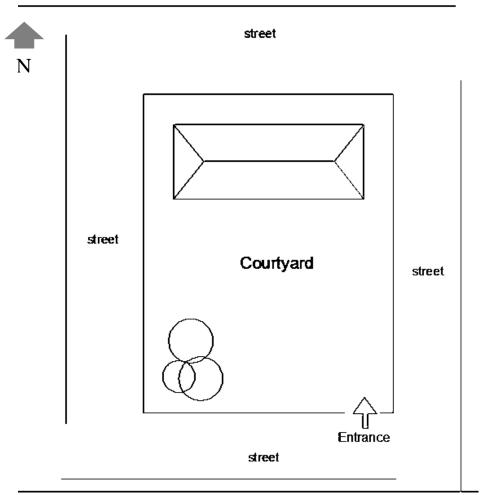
Site plan of traditional building in Rasht city (Memarian, 2006)
